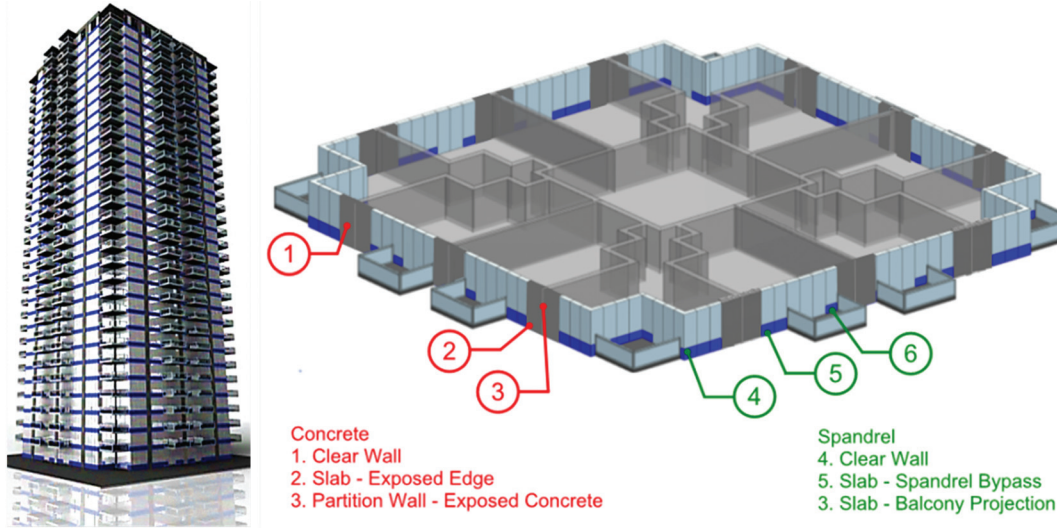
High-rise multi-unit residential building overall building envelope energy performance. Left: building rendering, right: floor plan and thermally relevant sections. Images used with author's permission (BC Hydro Power Smart 2014).
